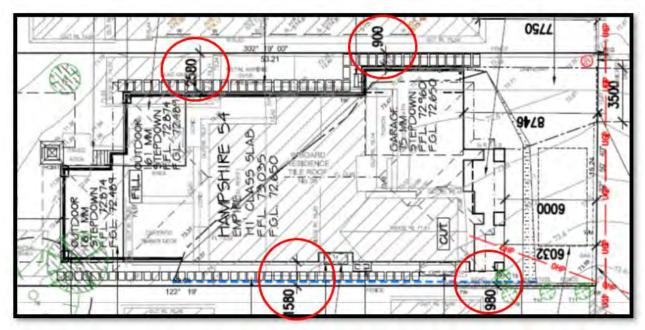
Plan showing the side setbacks of the proposed dwelling as shown in red circles.
